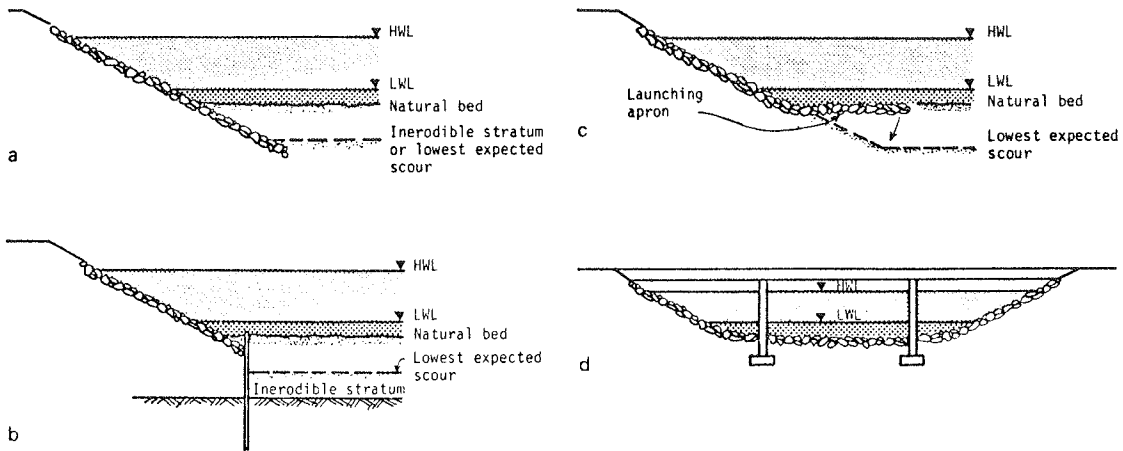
Methods of protecting bank revetment against undermining: (a) continue revetment down to inerodible stratum or to below lowest expected scour; (b) drive sheet-pile cut-off wall into inerodible stratum; (c) lay horizontal launching apron at or below the natural bed level (rip-rap settles on the slope as scour proceeds); (d) pave the entire bed of the bridge waterway opening (elevation of paving must be low enough to ensure acceptable velocities).
